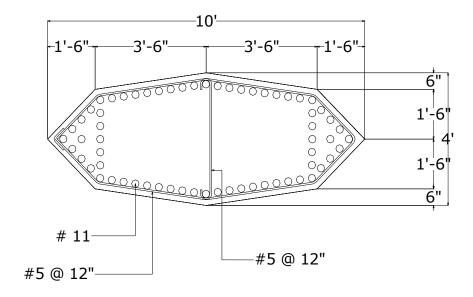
Cross section of 19WL,22WL and 23WL Columns of 1RWL-2RWL Off-Ramp (drawing not to scale)
